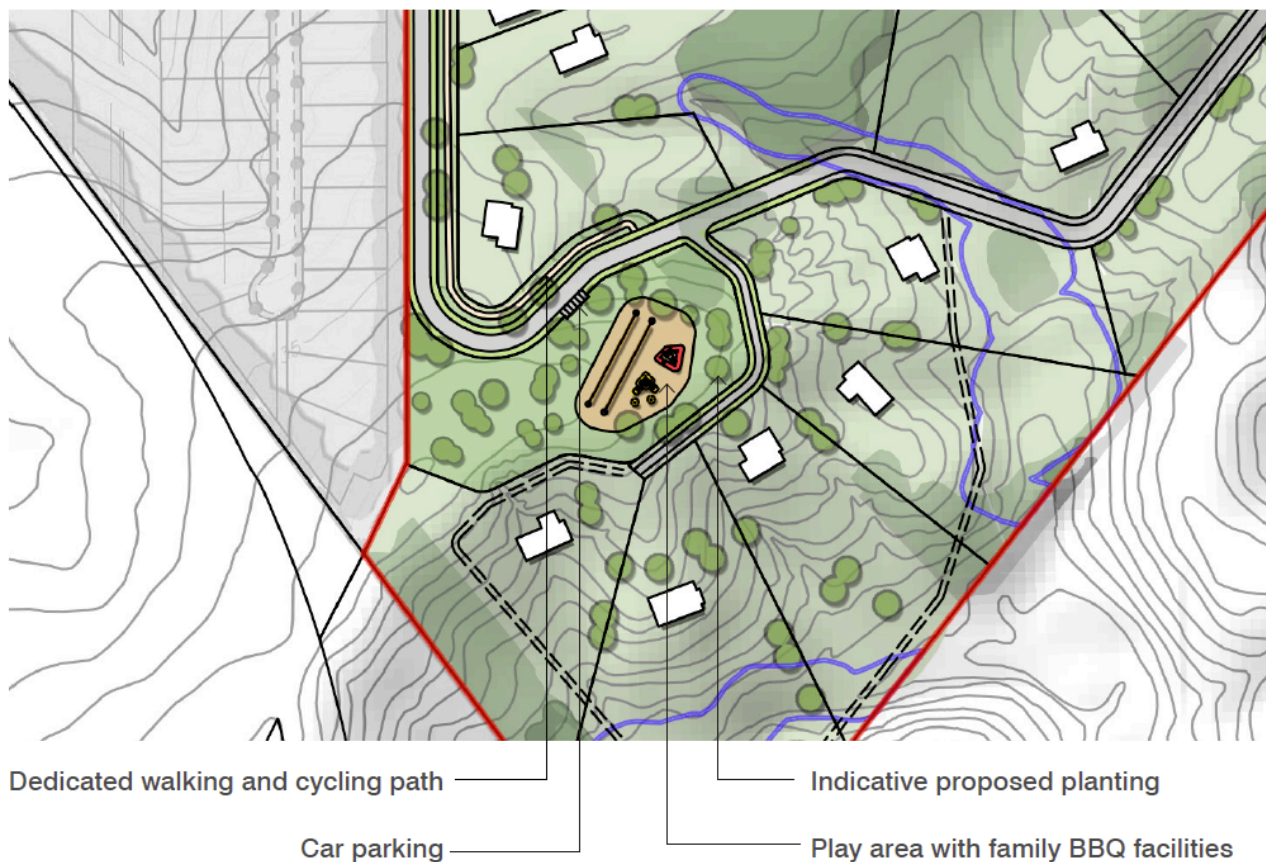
Open space concept plan – Lookout Park 2 (Source: Architectus)
